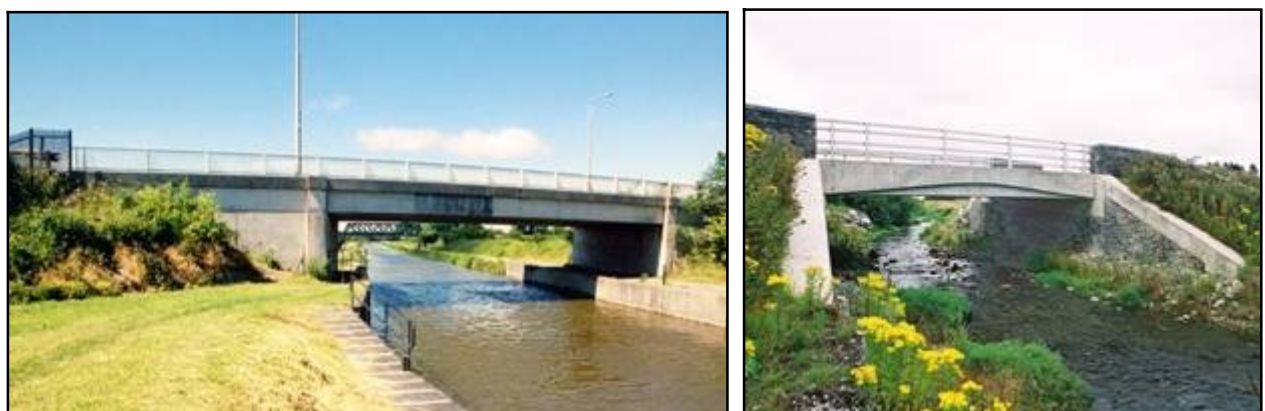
(left): Bridge over Grand Canal on Western Bypass, Tullamore (017-087). Fig 3.27b (right): Cushina Bridge over Cushina River (027-009).
